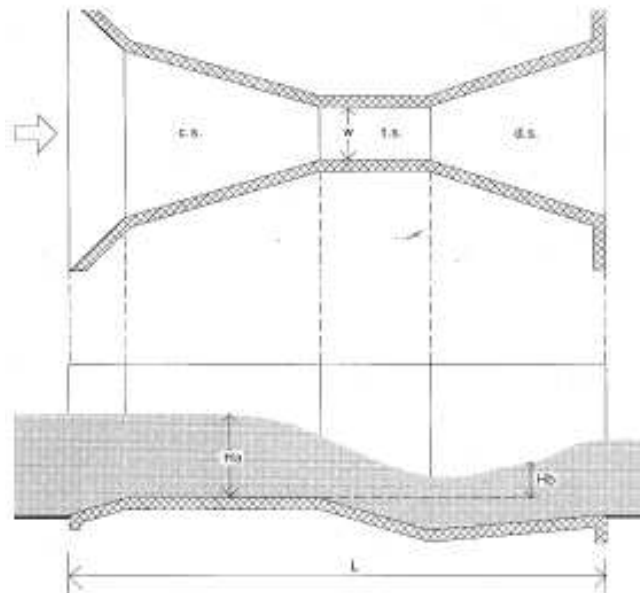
Plan & longitudinal profile of a Parshall flume, Bosch et al., 1992
